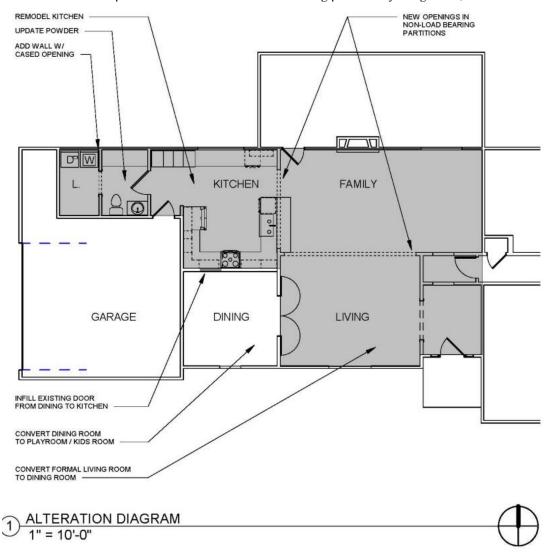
Floor Plan of the Scope of Work of the Renovation. Drawing provided by design firm, 2020.
